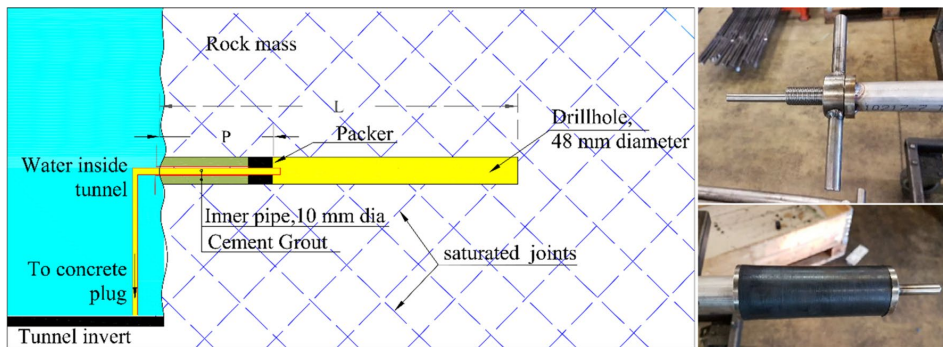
Schematic detail of borehole showing location of packer (left) and details of packer assembly (right)
